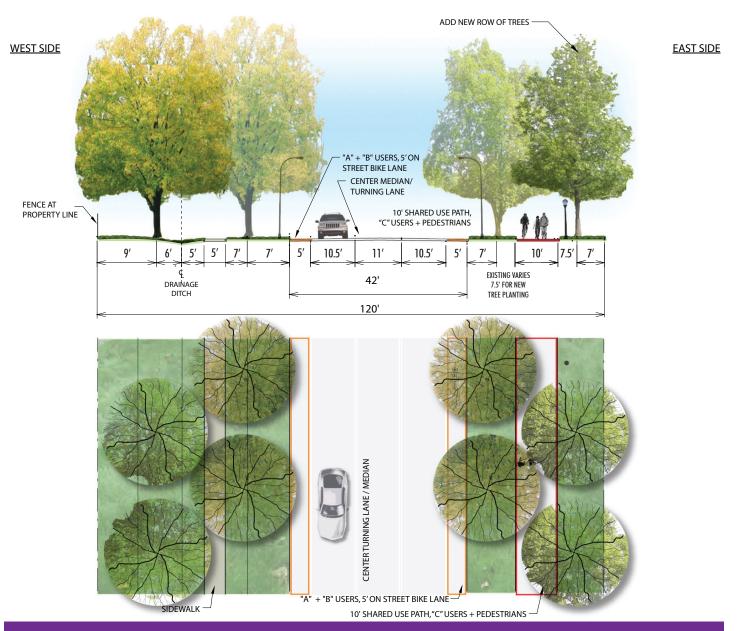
Southwestern Parkway: Zone 3 Prototypical Section & Plan
